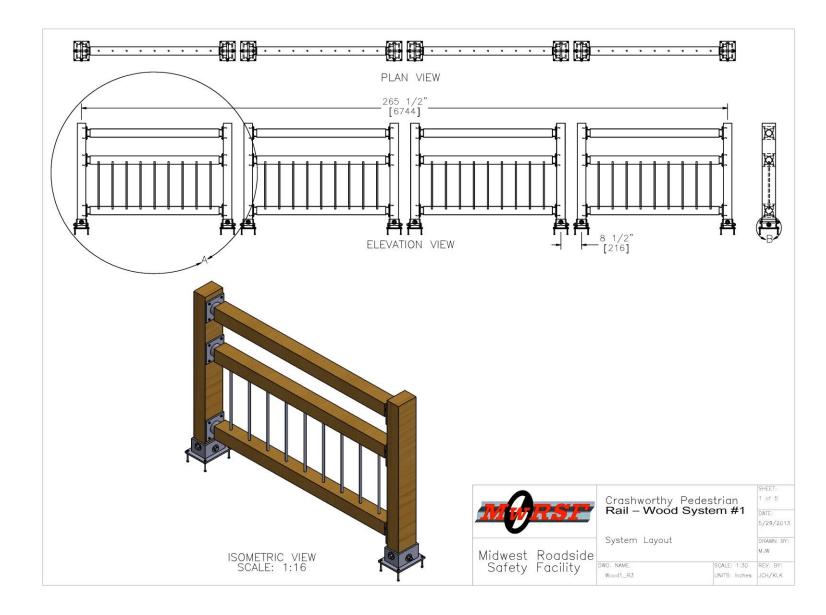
Modular Wood Rail, Design Concept WOOD1 (Sheet 1 of 5)
